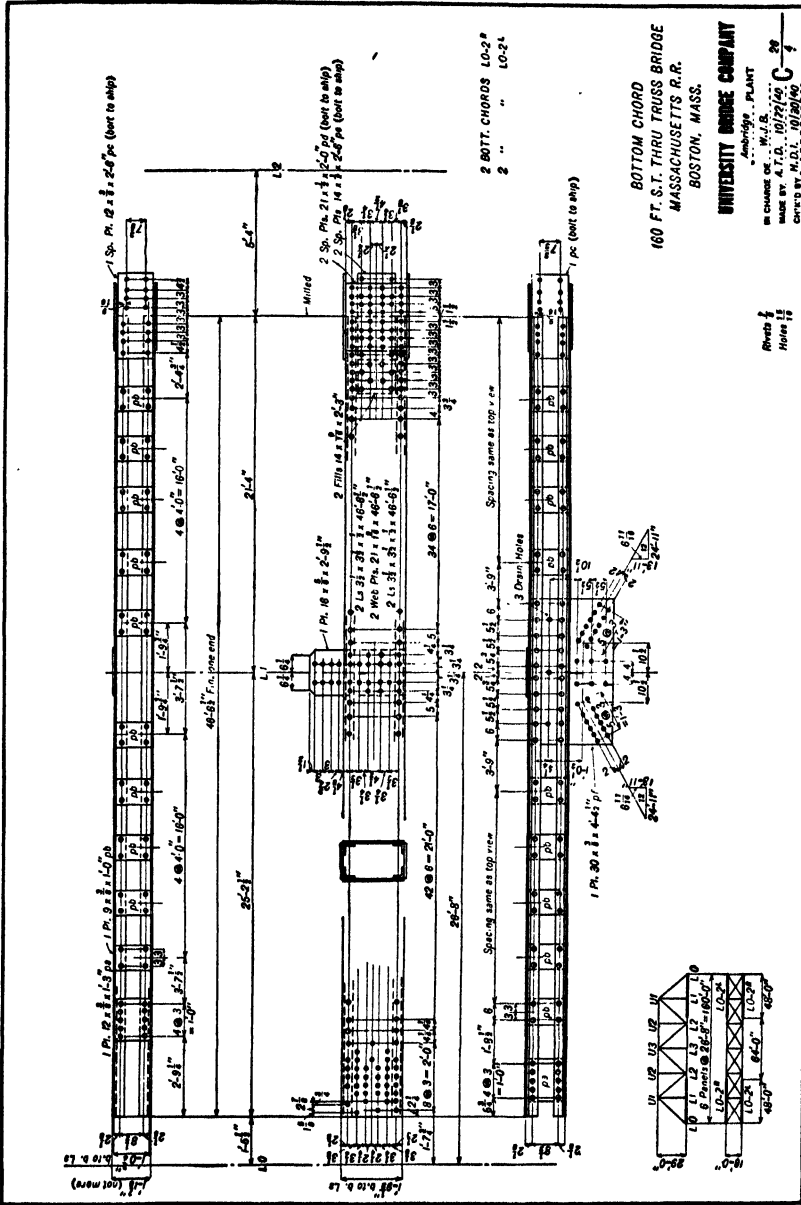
Bottom-Chord Member for Riveted Truss of a Railroad Bridge.
